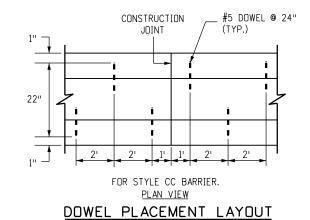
DETAILS SIMILAR TO STYLE CA EXCEPT AS NOTED. USE CONCRETE BARRIER END ANCHOR WHEN NECESSARY. SHOWN 36 INCH ROADBED SURFACES OFFSET.
